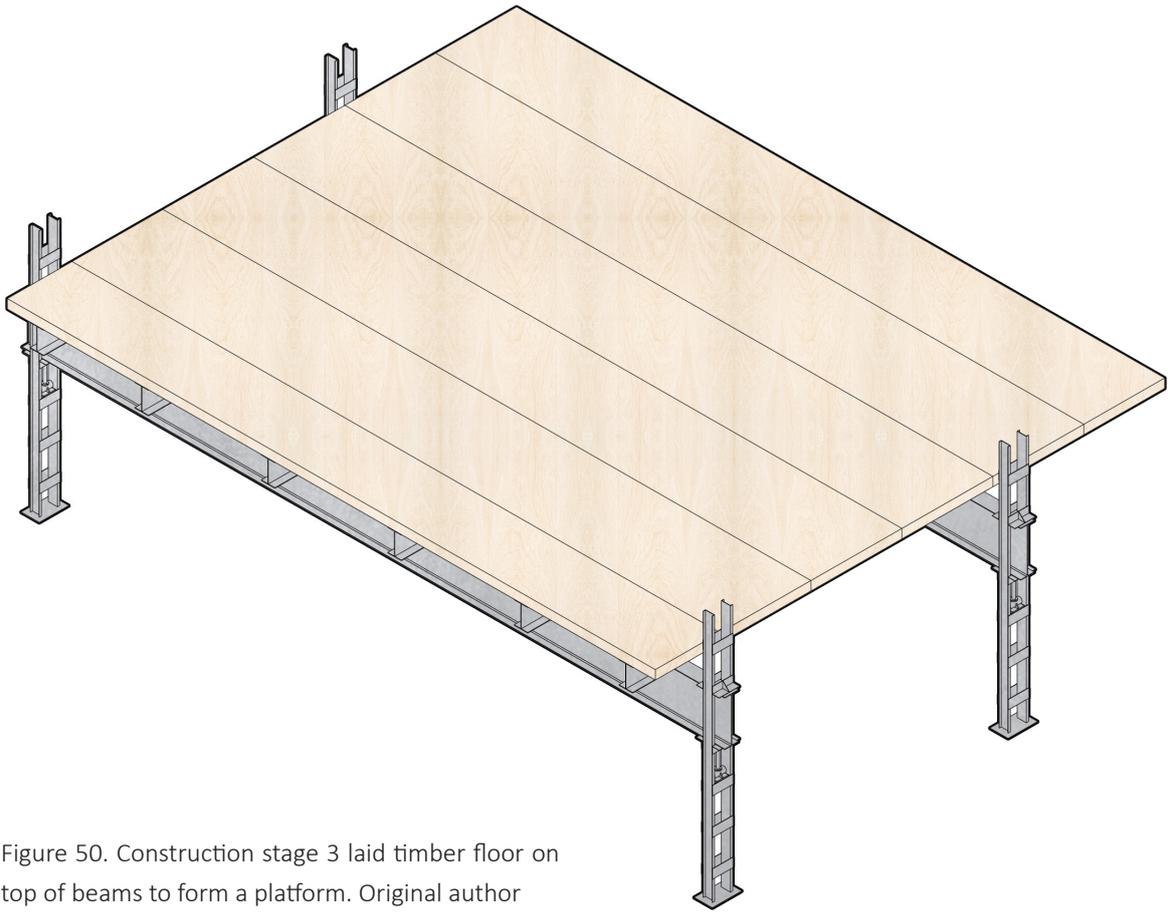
Construction stage 3 laid timber floor on top of beams to form a platform. Original author
